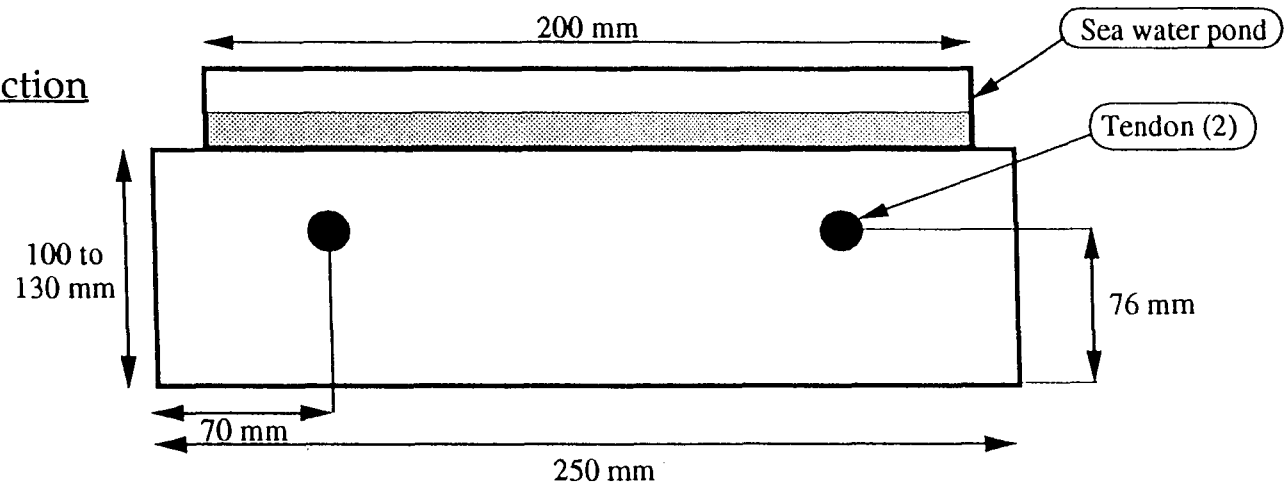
Schematic illustration of a prestressed concrete beam specimen and sea water electrolyte bath.
